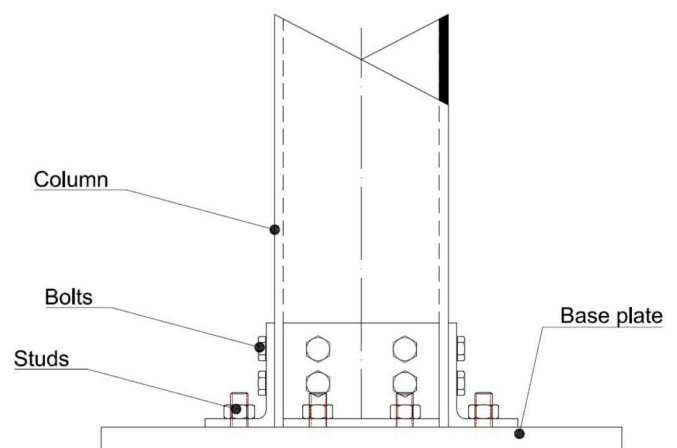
Sketch of a base plate-to-tubular column joint with unequal-sided angle cleats and welded studs.
